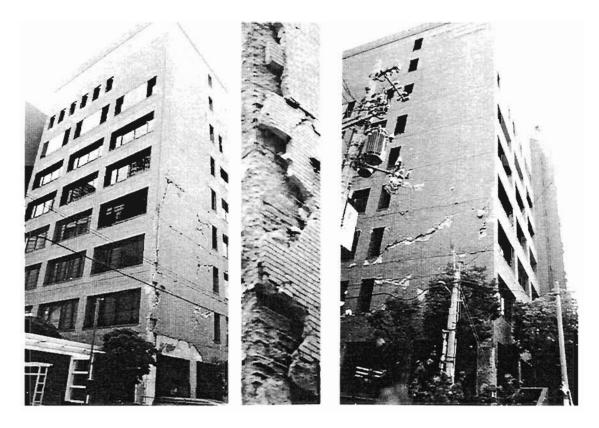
Spalling attributable to lack of longitudinal shear walls
